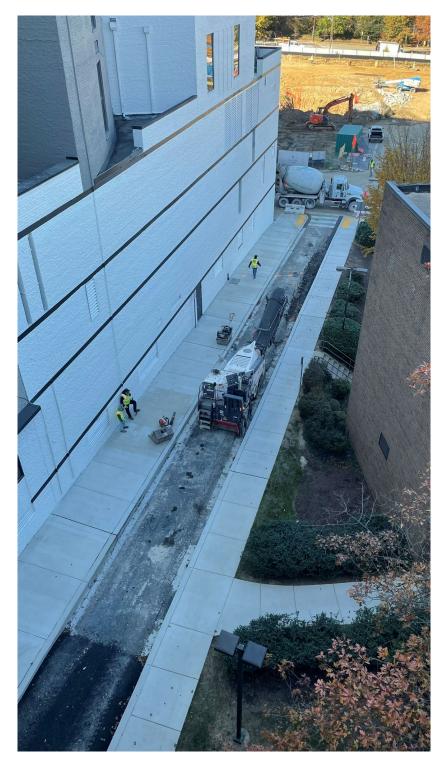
View of the Cameron Street to Planning Place Bikeway Under Construction in November 2021
